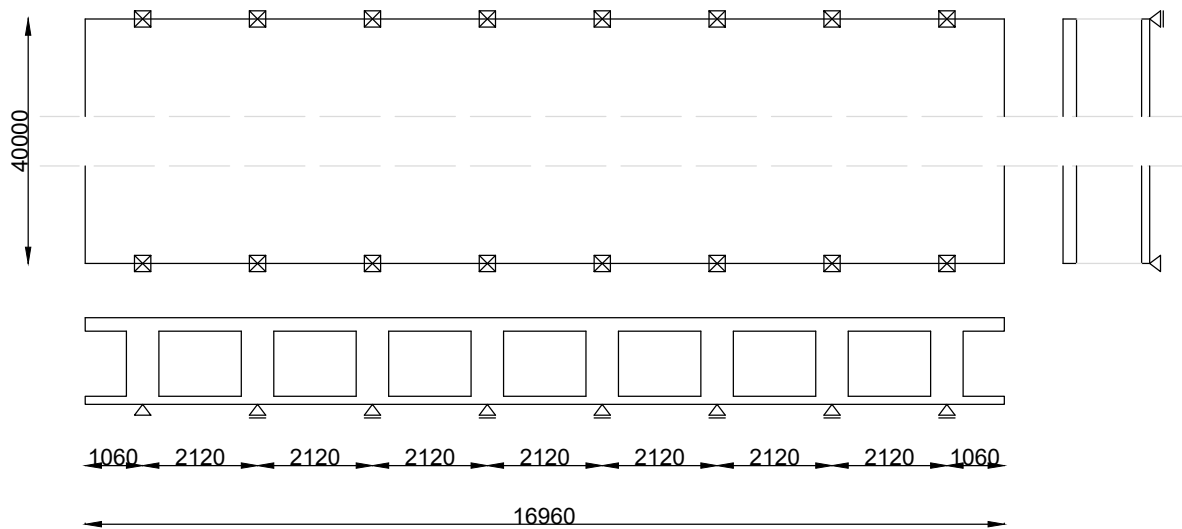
Supports bridge decks case study, top view and side view (mm)
